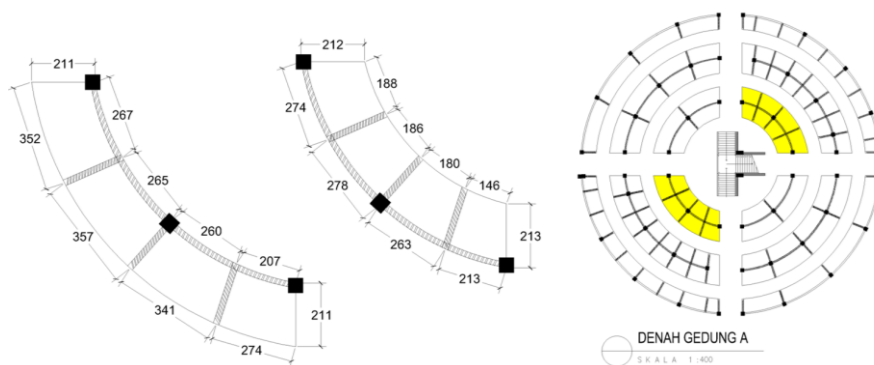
Two-Faced Four-Row Stall Layout Block 1 (Building A) (source: author)
